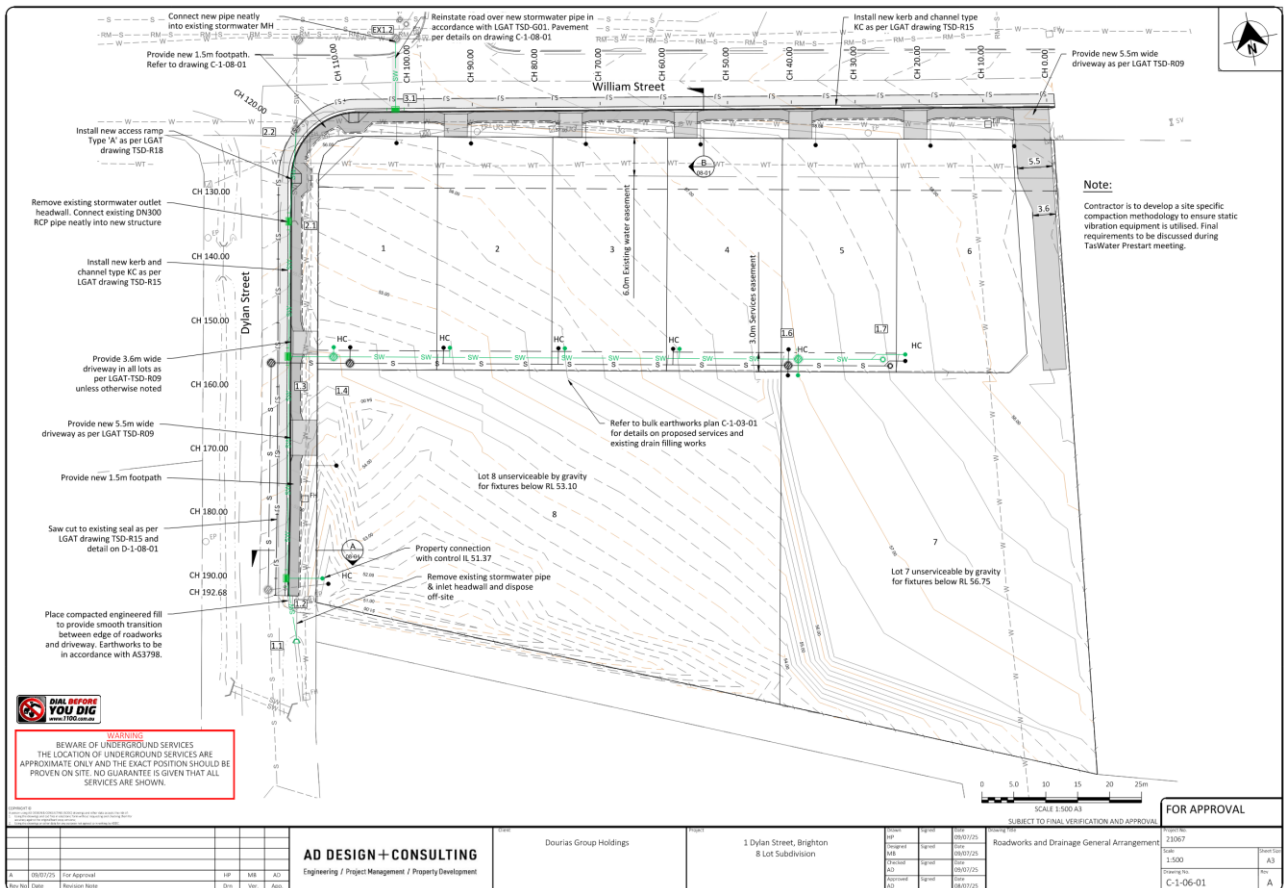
Subdivision civil Roadworks and Drainage General Arrangement plan.
